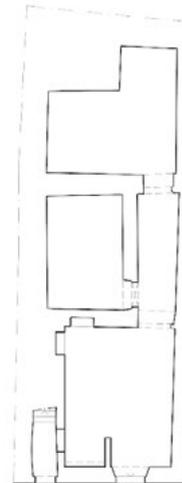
Groundfloor plan. Rua do Afã 12, Estremoz (Source: Rosado, 2021).
